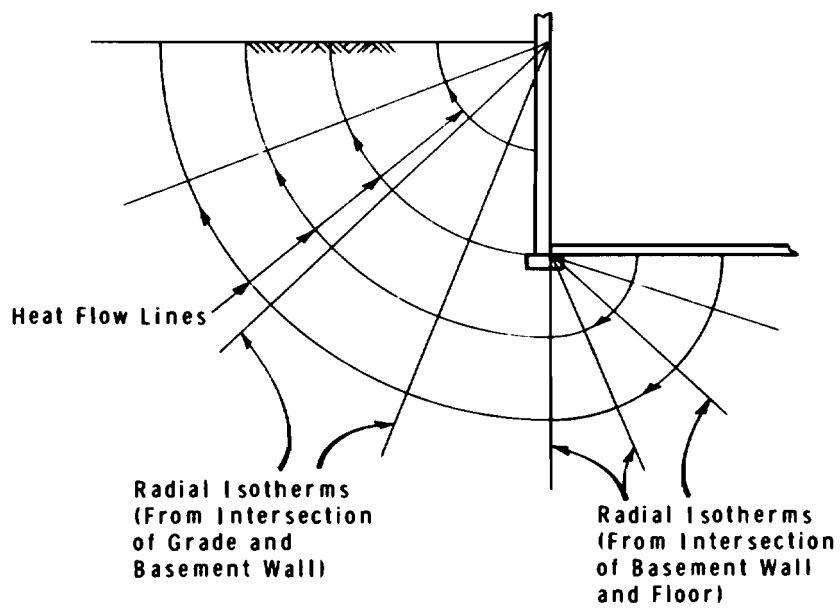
Paths of heat flow from a basement wall and floor to the ground surface
